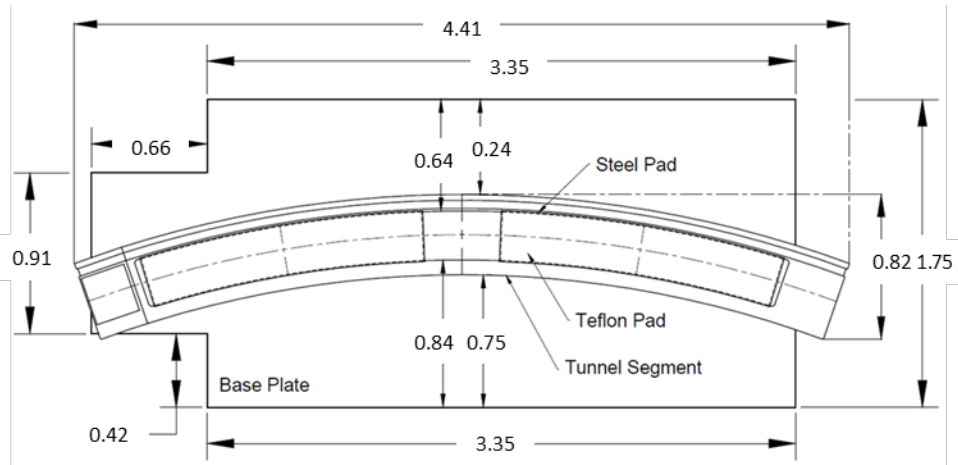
Plan view of load pad location at top and bottom of segment (dimensions in m).
